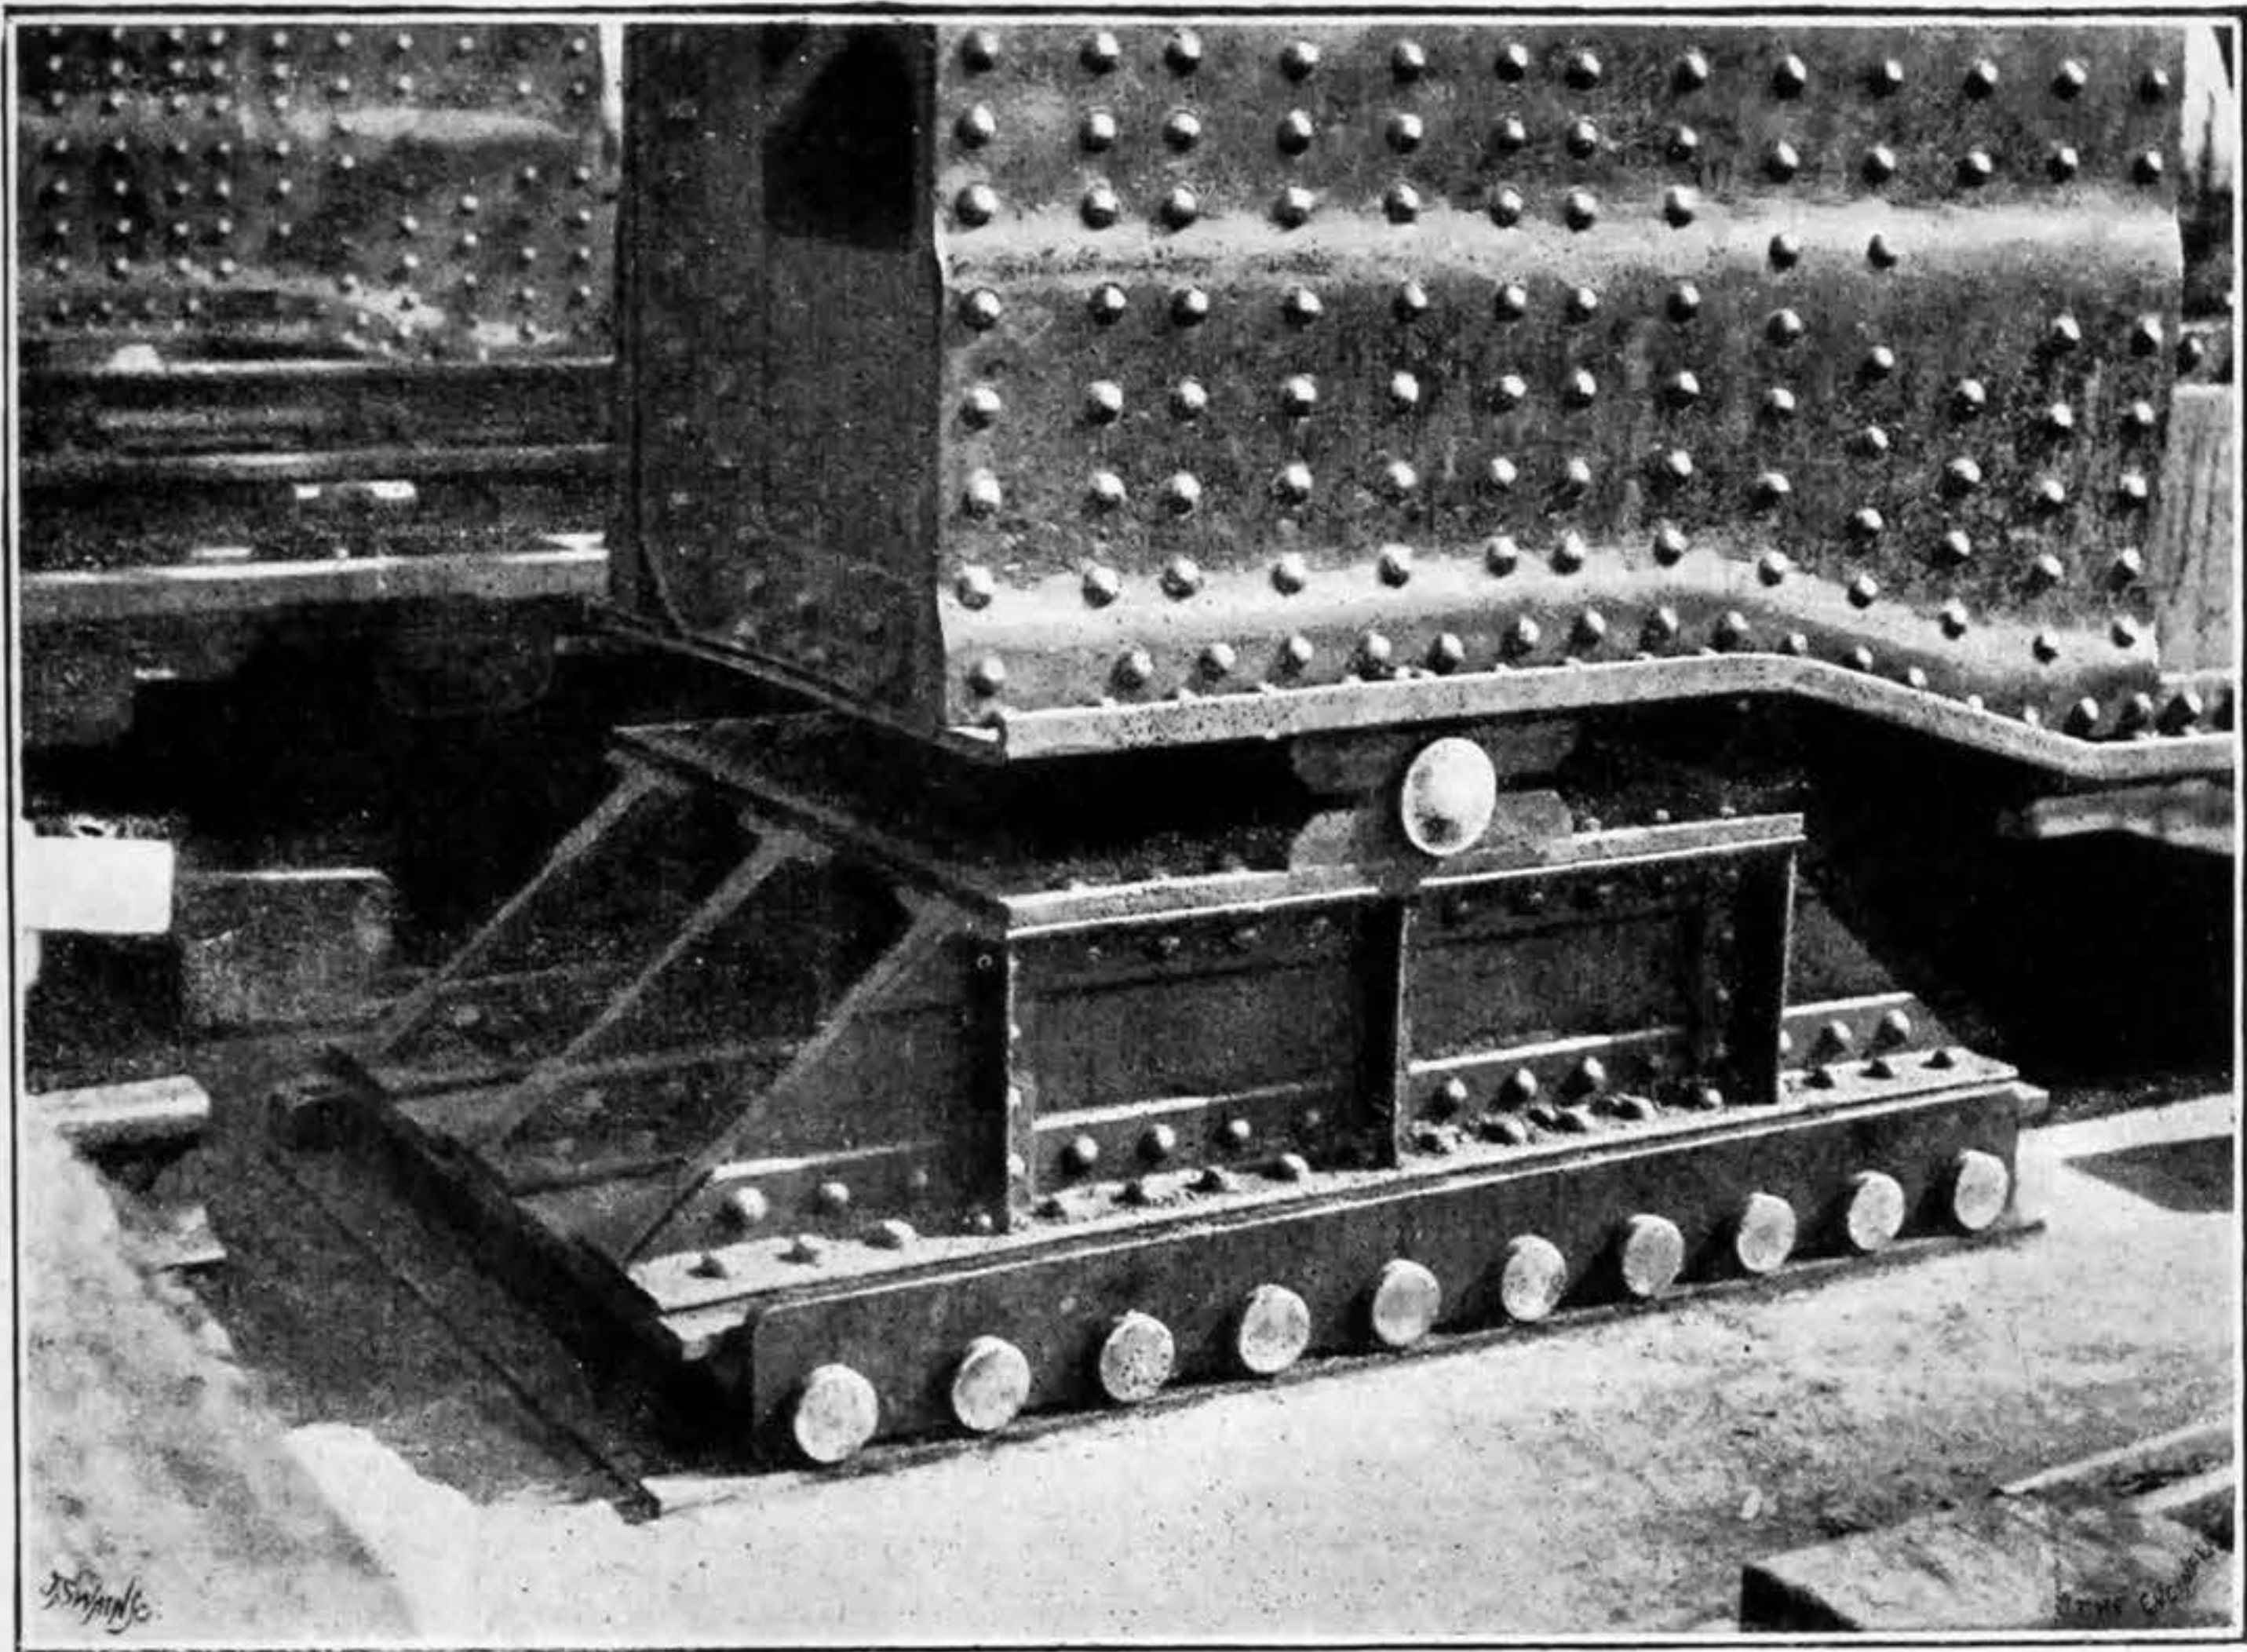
GENERAL VIEW OF ROLLER BEARINGS.
